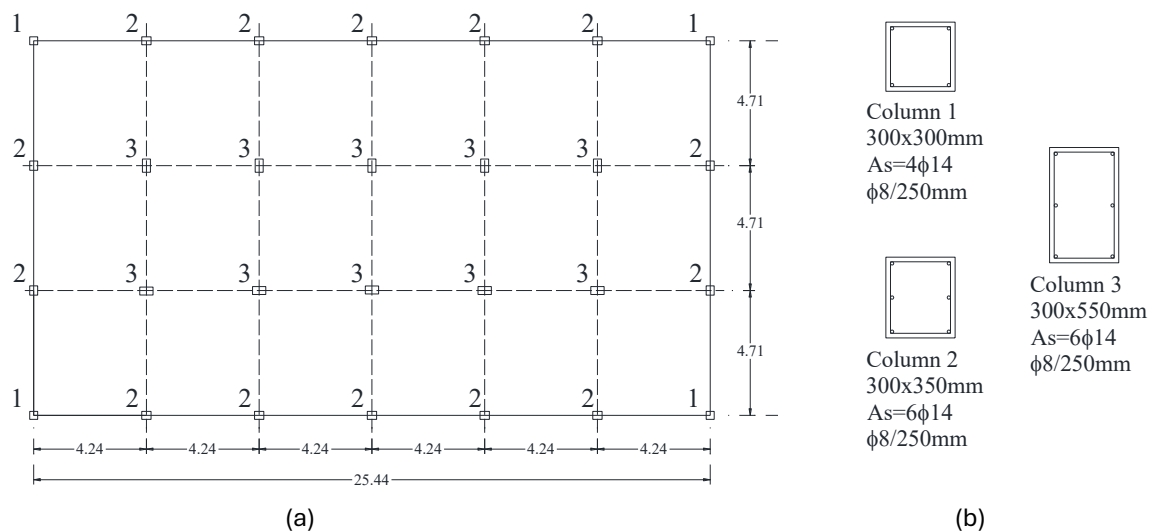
Case-study building: (a) in-plan view and (b) column cross-section and reinforcement details for the first storey (Adapted from Gaetani d'Aragona et al. [11]).
